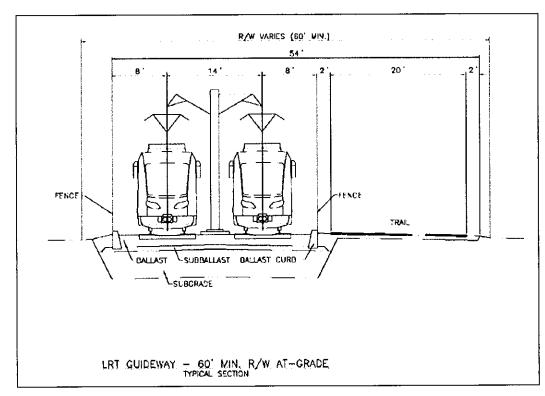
A section showing the guideway adjacent to a bike / walking trail (from the DEIS).
